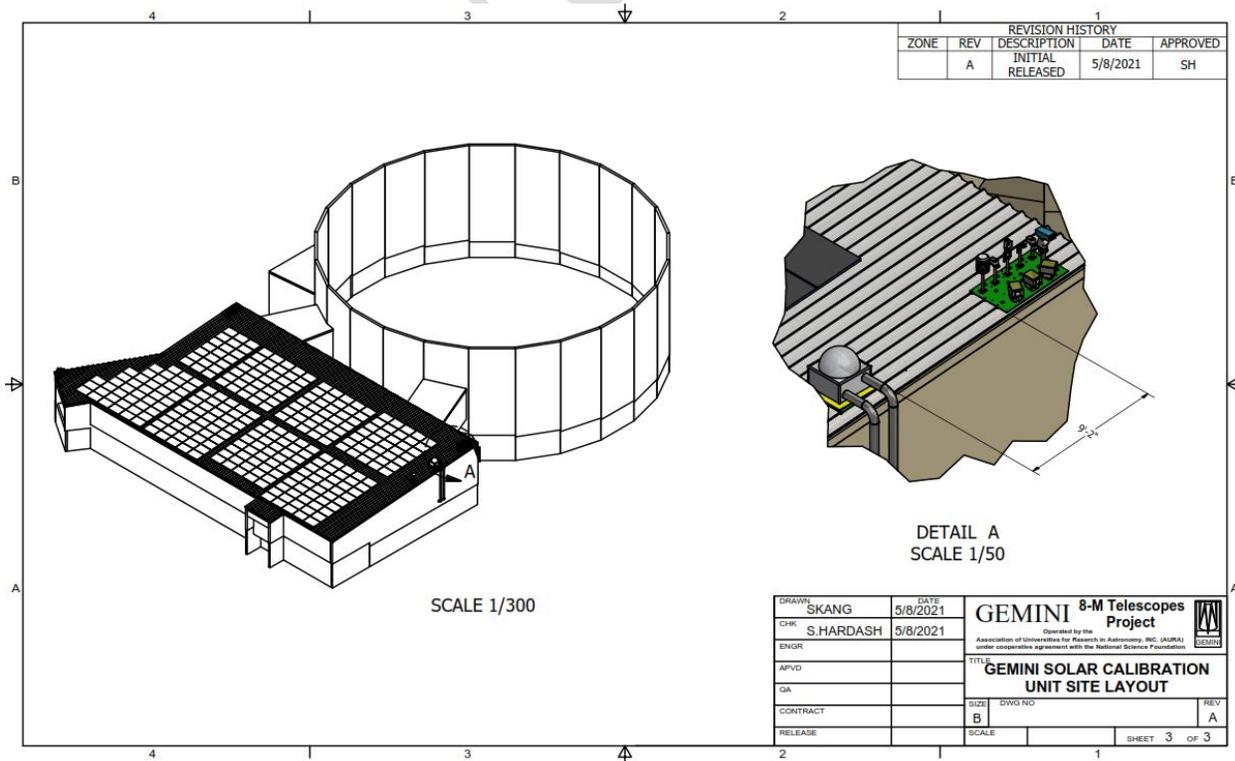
Detail location view of the proposed solar calibration unit on the Gemini Support Facility roof.
